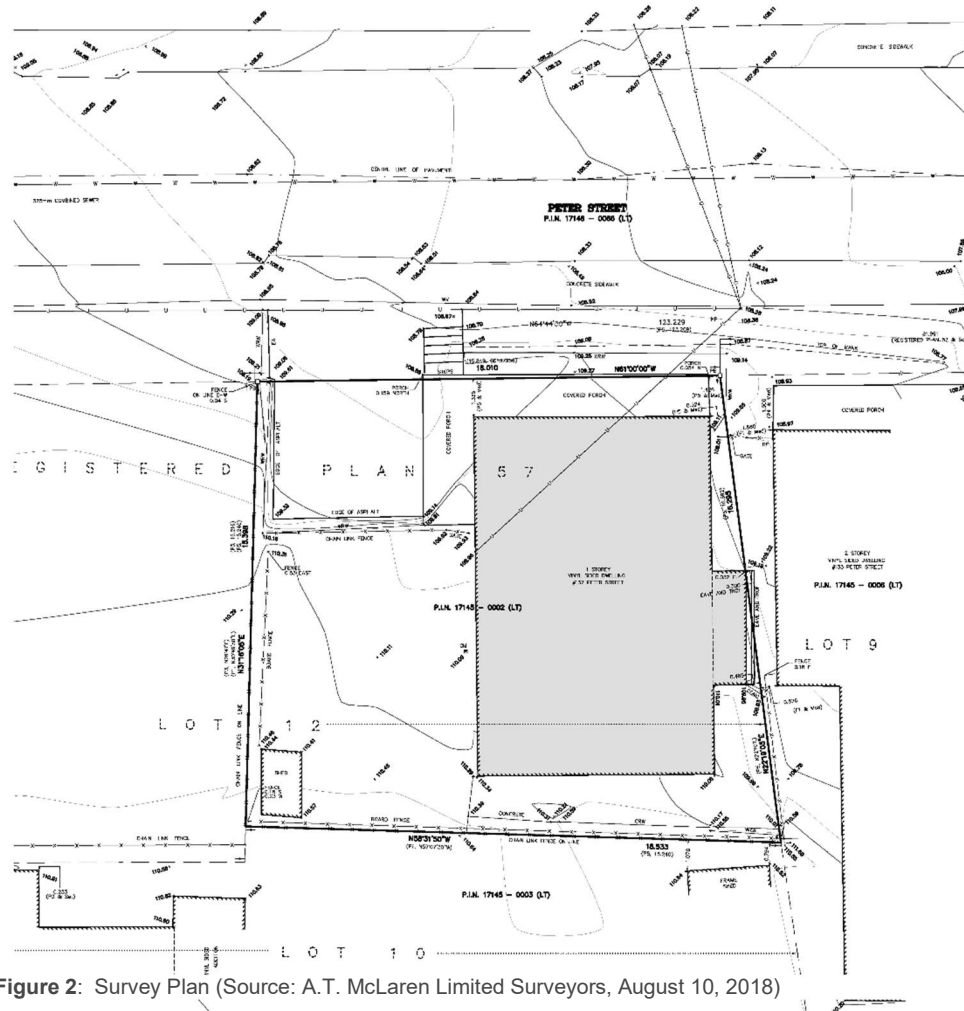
Survey Plan (Source: A.T. McLaren Limited Surveyors, August 10, 2018)
